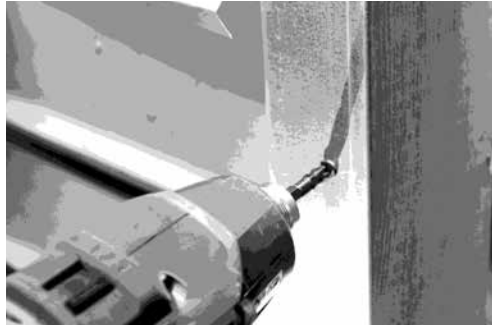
Remove unit mounting screws along one side, along the top and bottom
